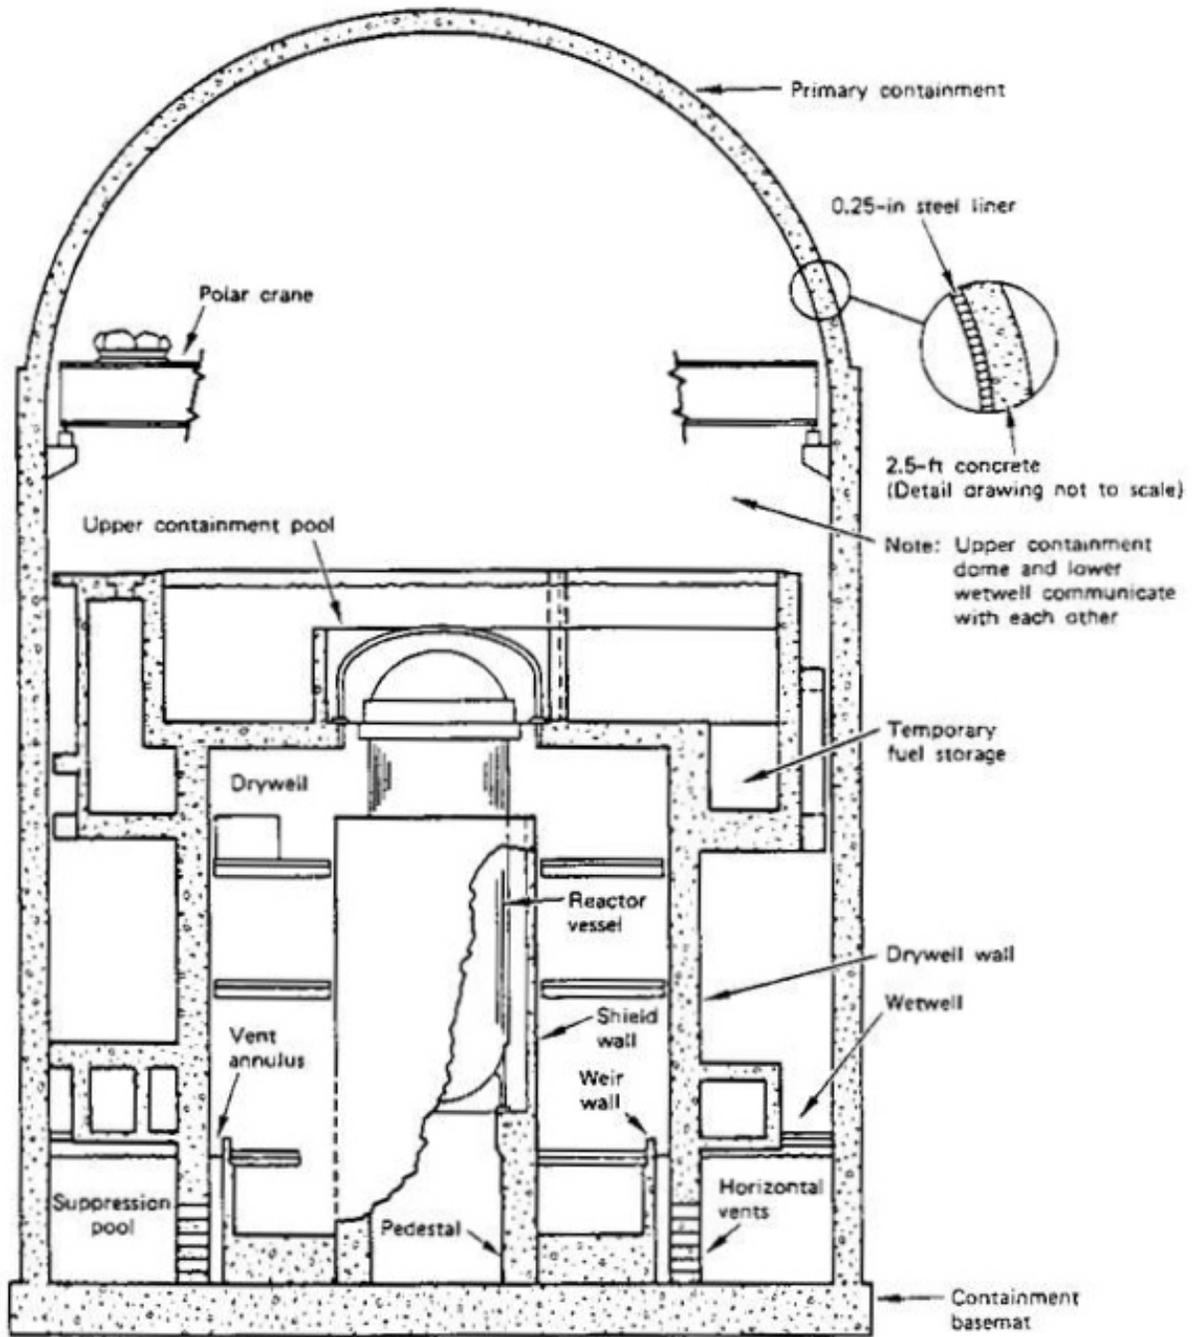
Steel-Reinforced Concrete Mark III Containment with Steel Liner
